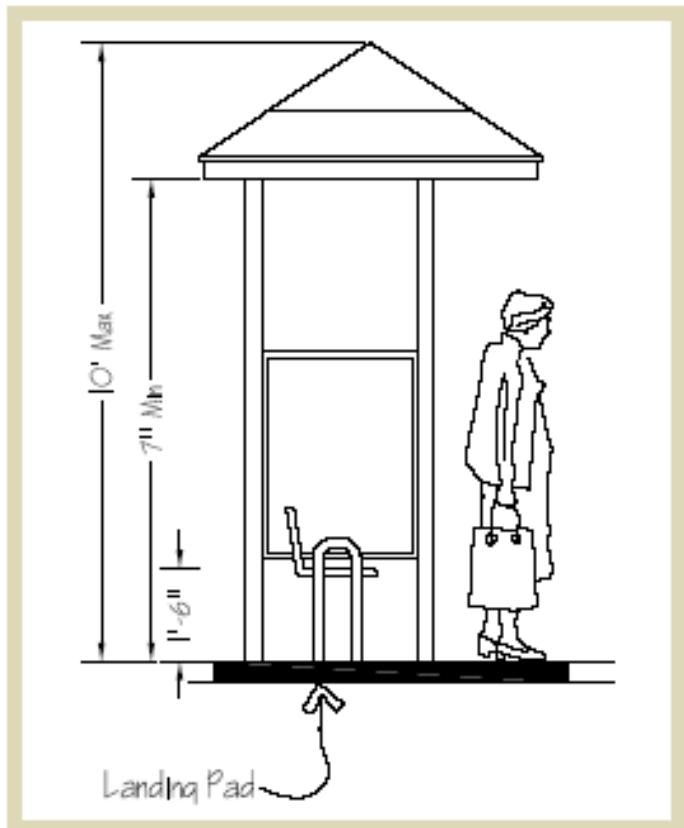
| Cross section of a small shelter with seating with typical vertical dimensions.
